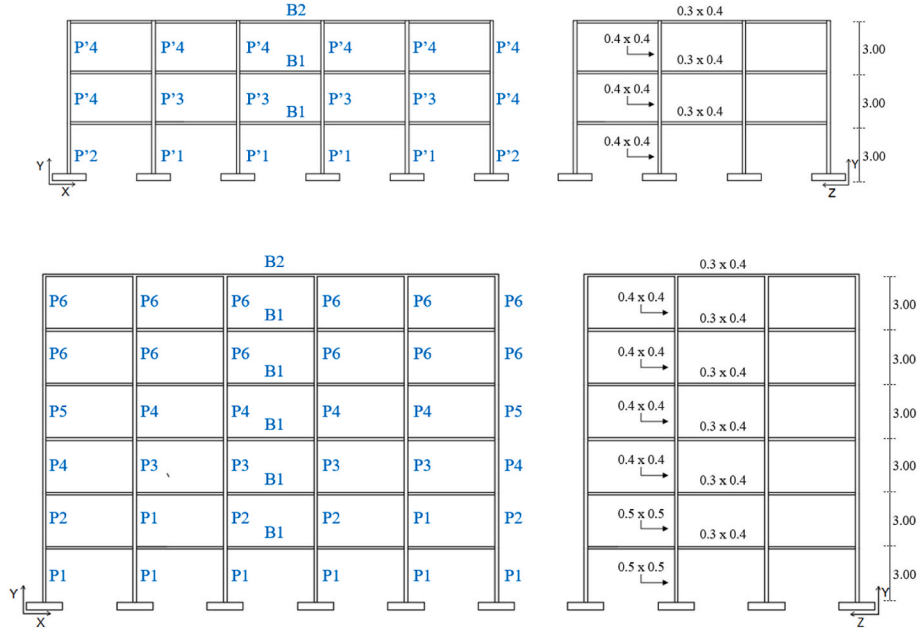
Elevation view of the case-study structures and typical cross-sections of beams and columns (dimensions in meters).
